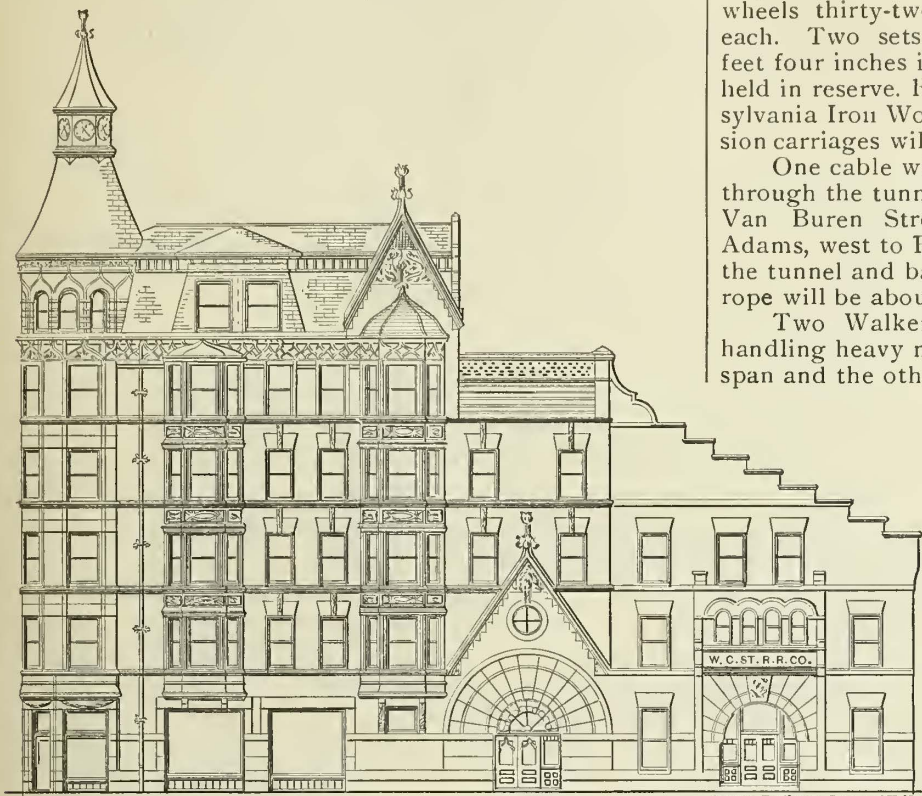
TWELFTH STREET ELEVATION, NEW CABLE STATION—WEST CHICAGO STREET RAILWAY.
